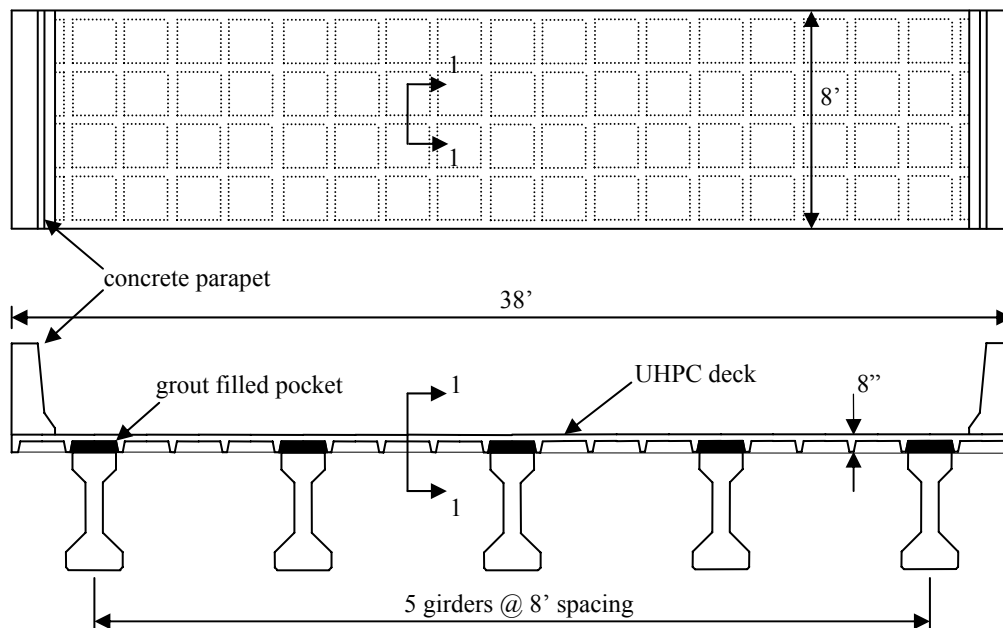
Illustration. UHPC Bridge Deck Panel Plan and Cross Section View
